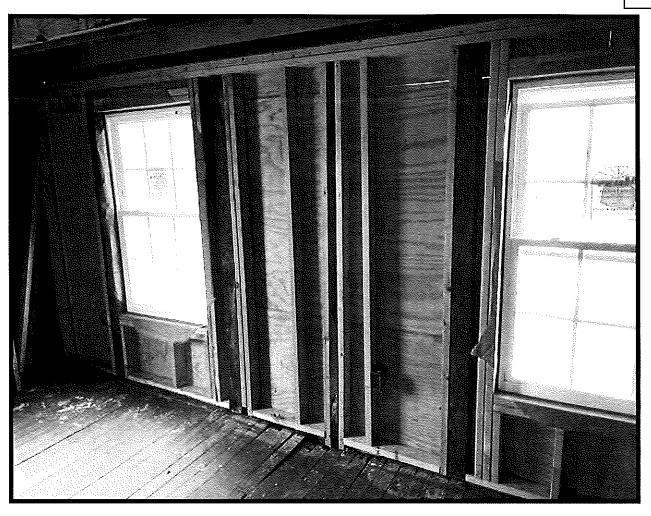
Significantly modified/reinforced stud walls/structural sheathing & new windows.
